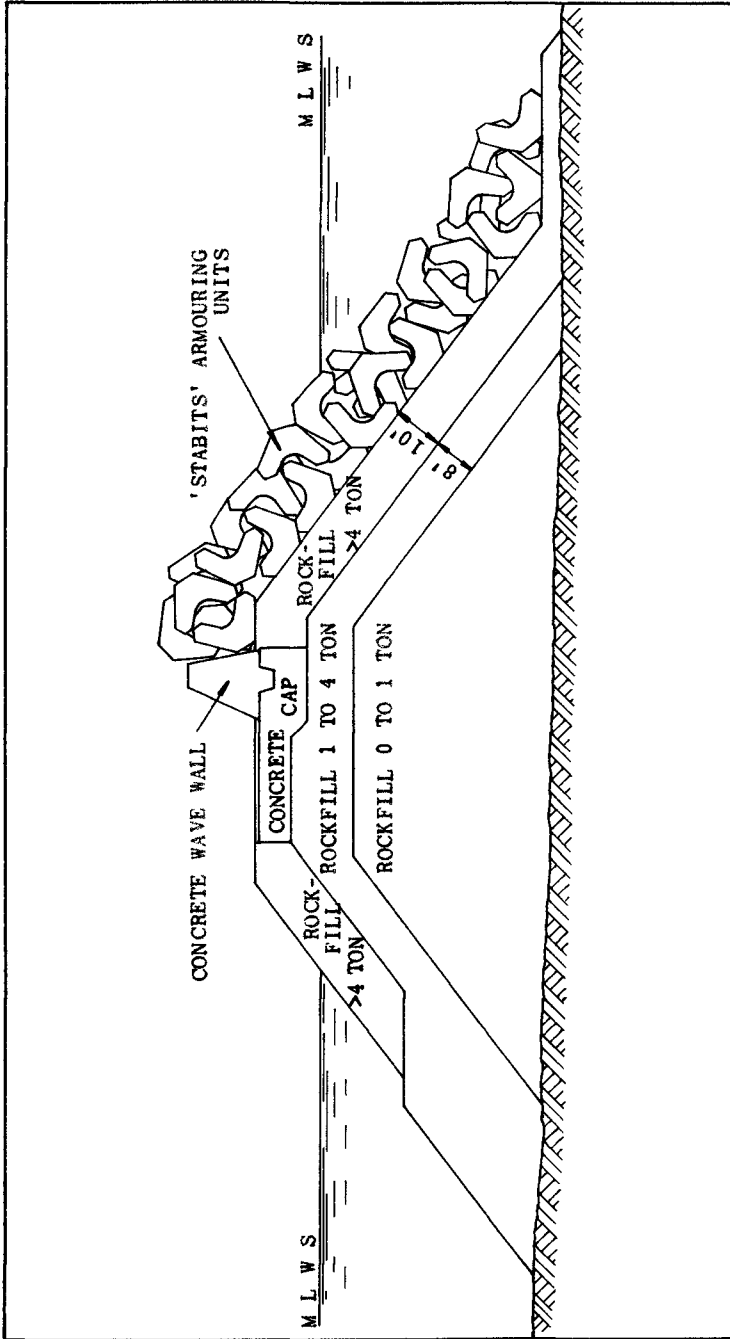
TYPICAL BREAKWATER CROSS-SECTION AT BENGHAZI
